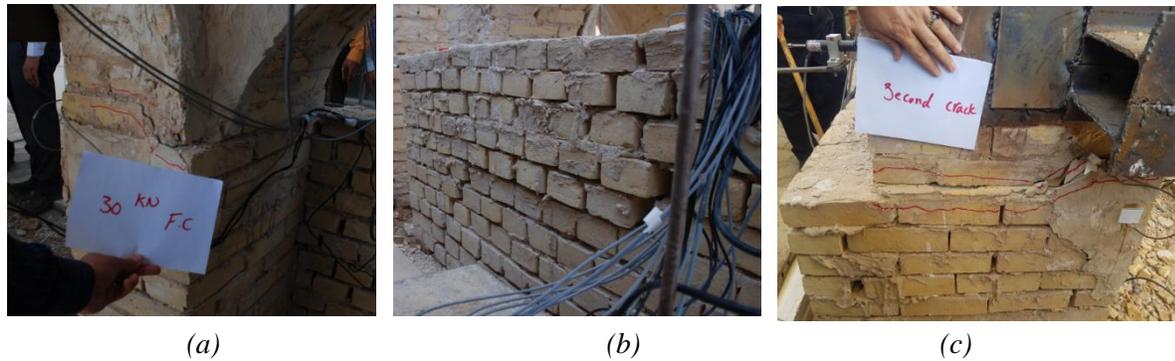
Cracks and openings in unreinforced structures under lateral loading;(a) Cracking beneath the force applied under 30 KN; (b)cracks inside base under horizontal load of 26 KN; (c) base movement due to horizontal load under 25KN.
